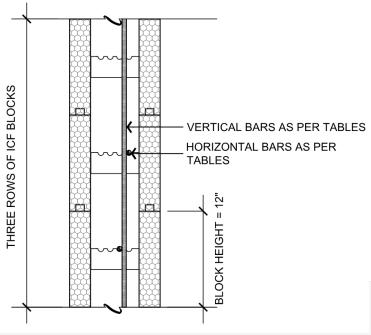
Below Grade Wall Reinforcing Placement for All Wall Thicknesses.
